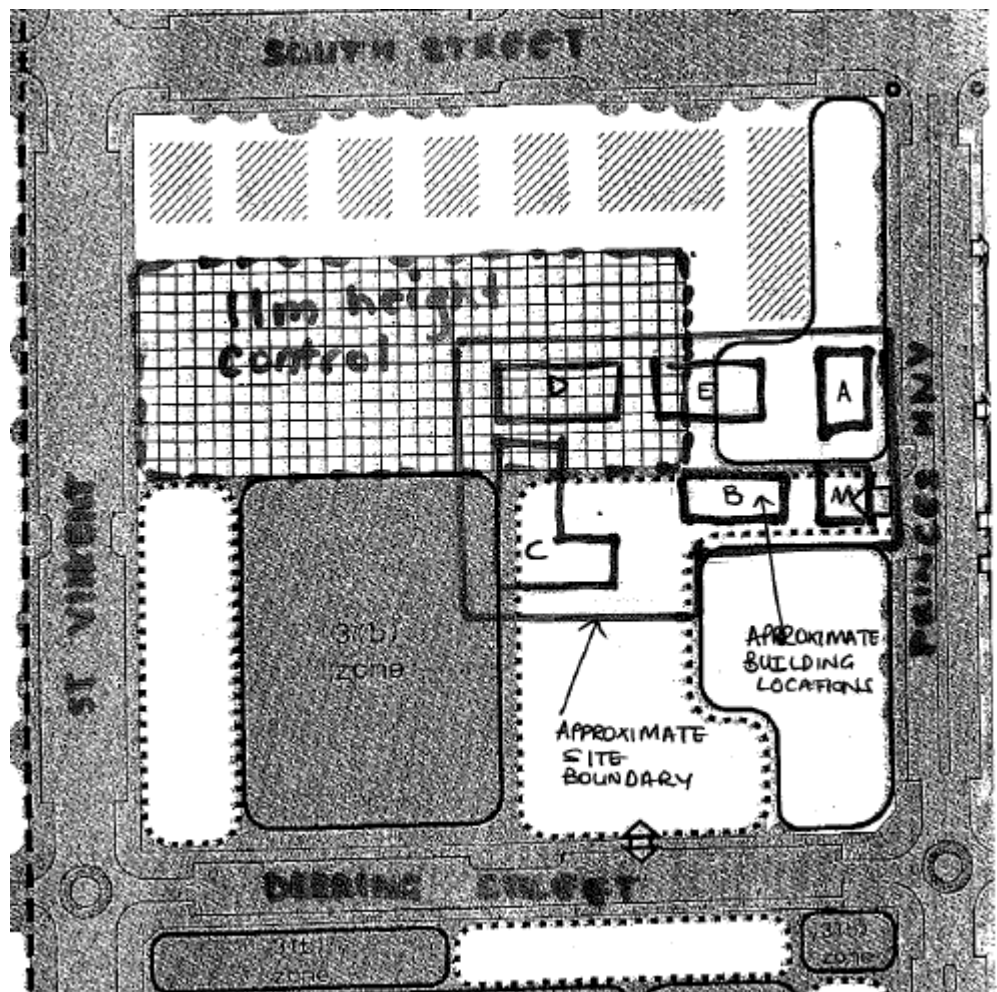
Extract from supporting plan to DCP 56 outlining height controls
